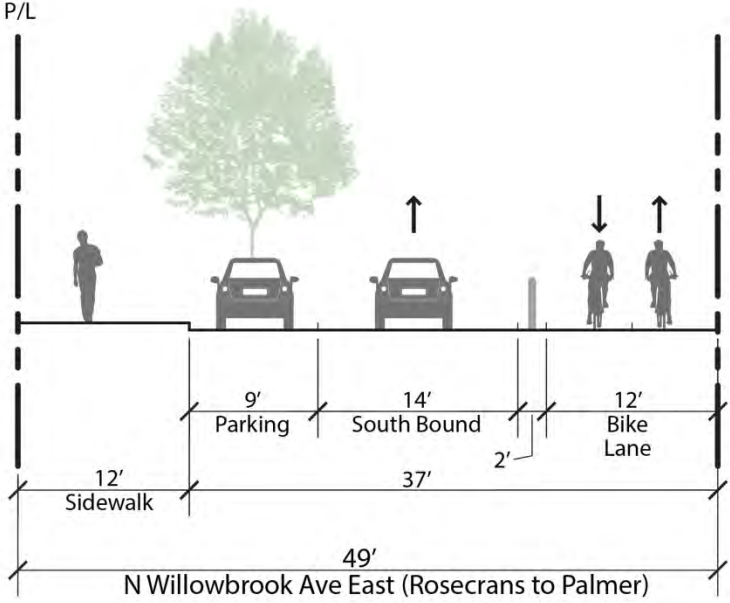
North Willowbrook Avenue East (Rosecrans to Palmer) Typical Cross-Section.
